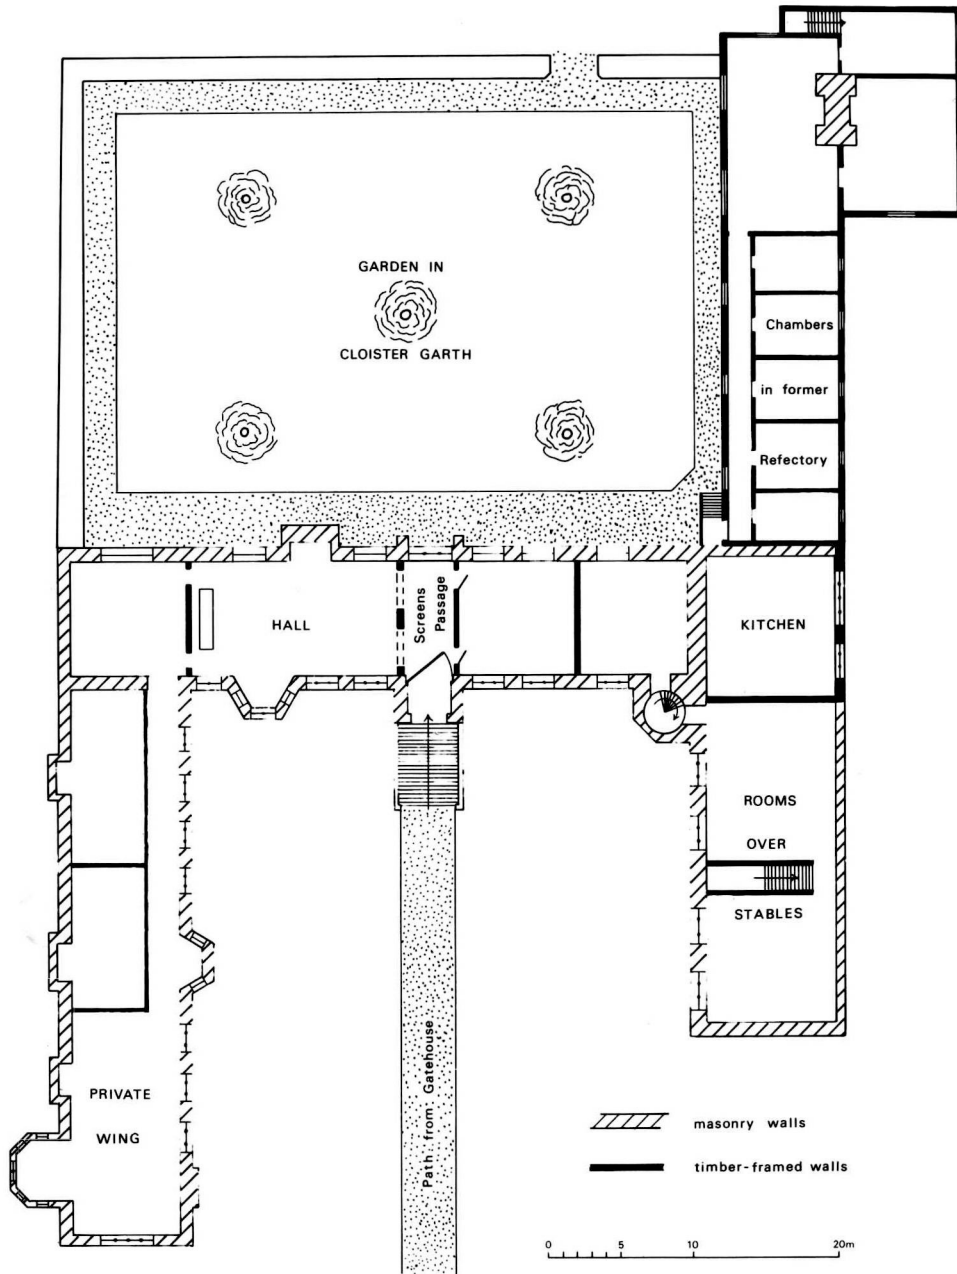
A suggested plan at first-floor level of post-Dissolution house.
